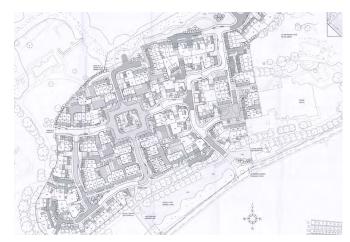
Layout - south of Lord Mayor Treloar Hospital
